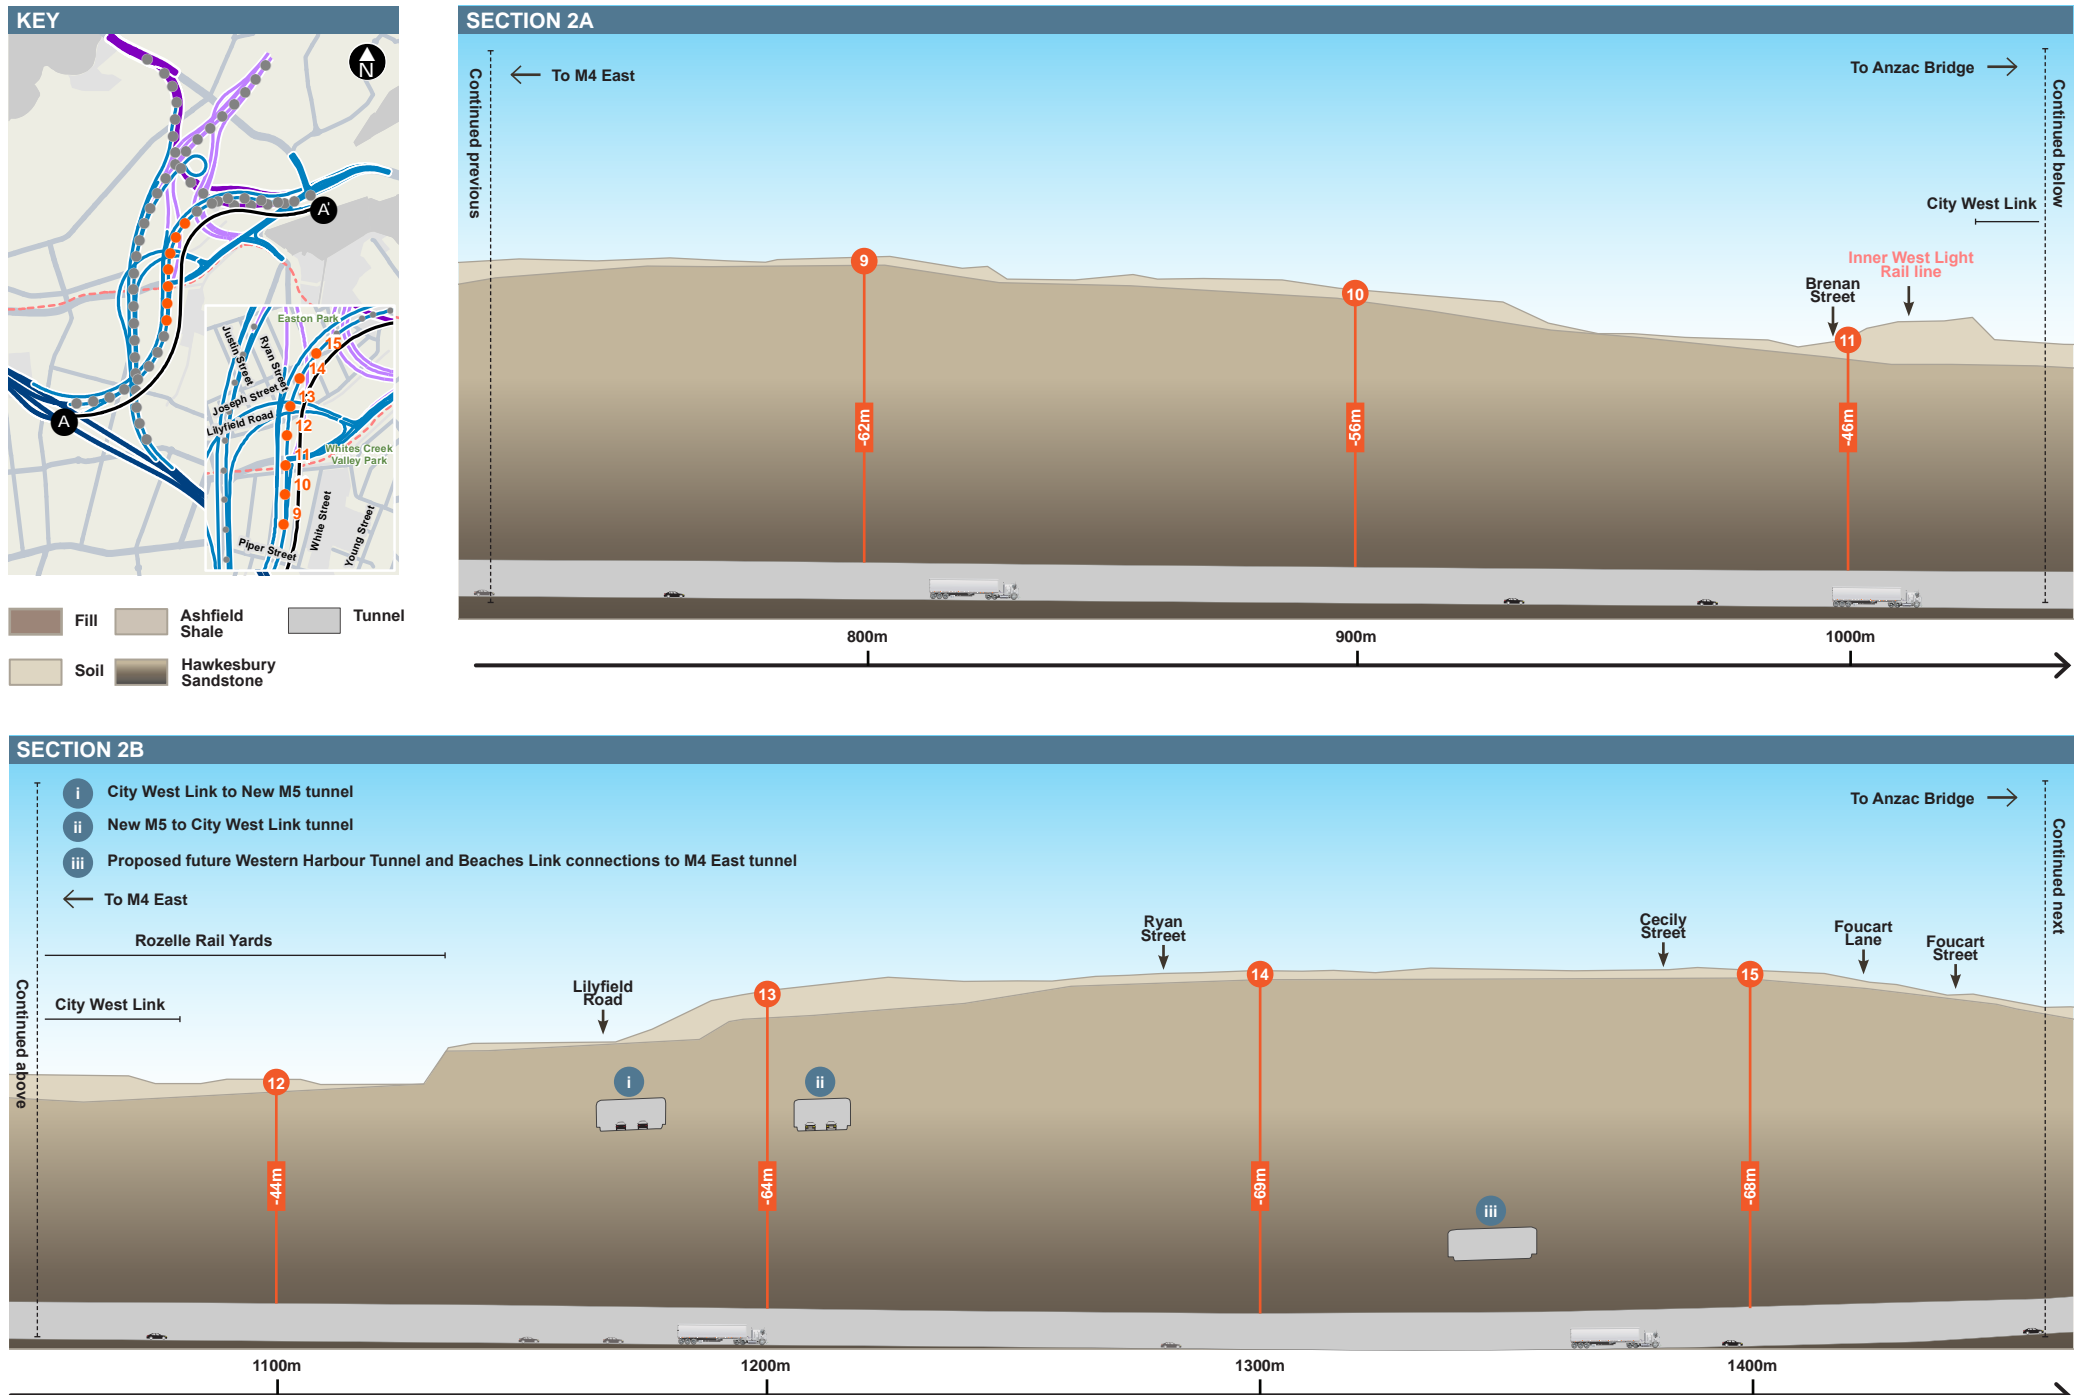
Geological long-section - M4 East to Anzac Bridge - Section 2
